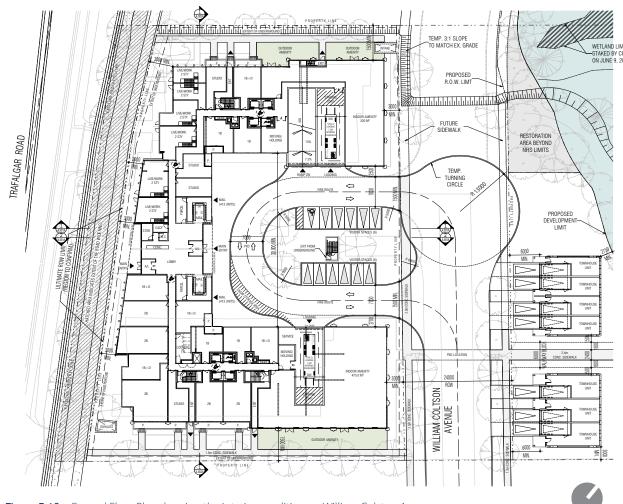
Ground Floor Plan showing the interim condition on William Colston Avenue
